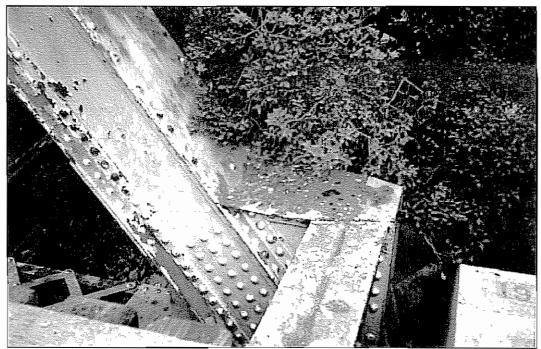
View shows section loss in the top flange of Floorbeam 5 of Span 4, under the left rail of the track.
